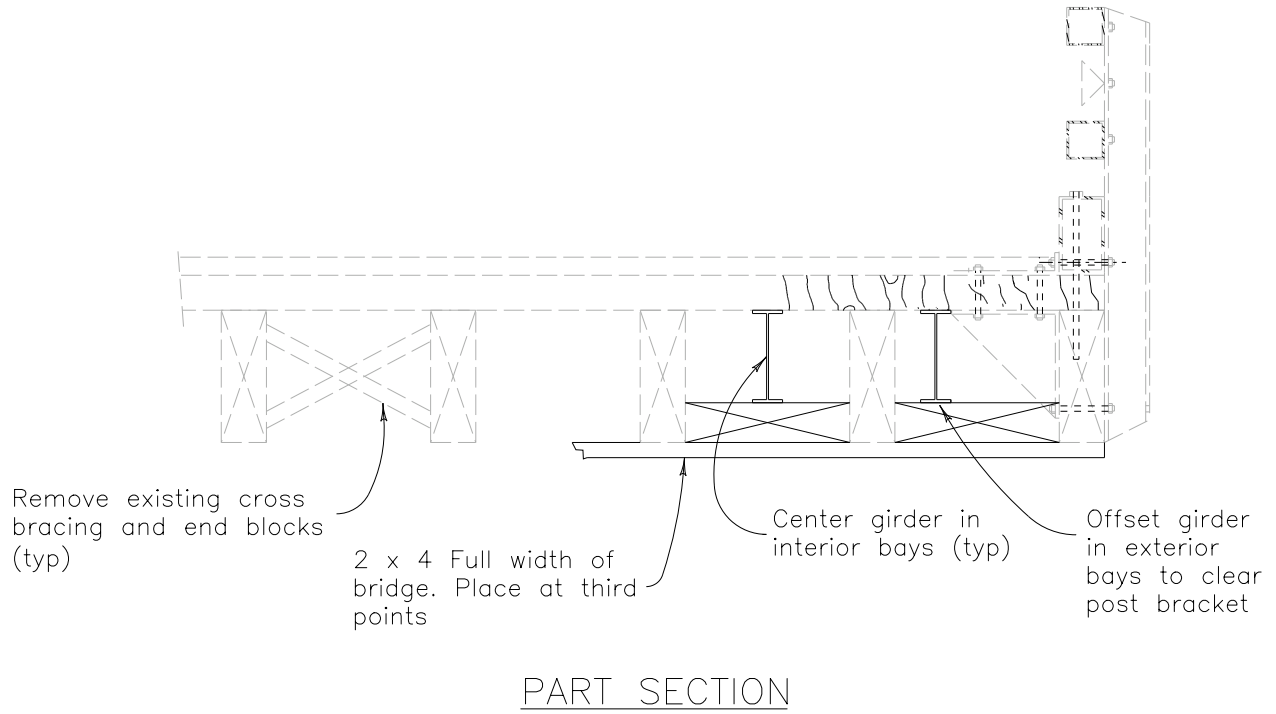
(H)-3 Sample Section of adding steel girders to a Timber Bridge
